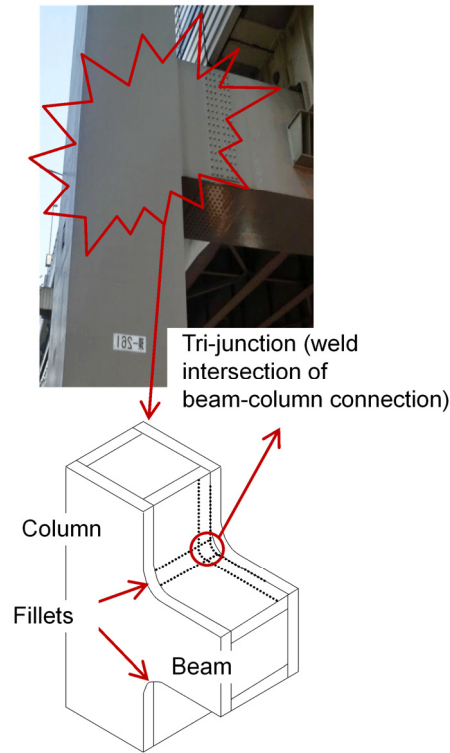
Beam-column connection in steel moment-resisting frame piers
